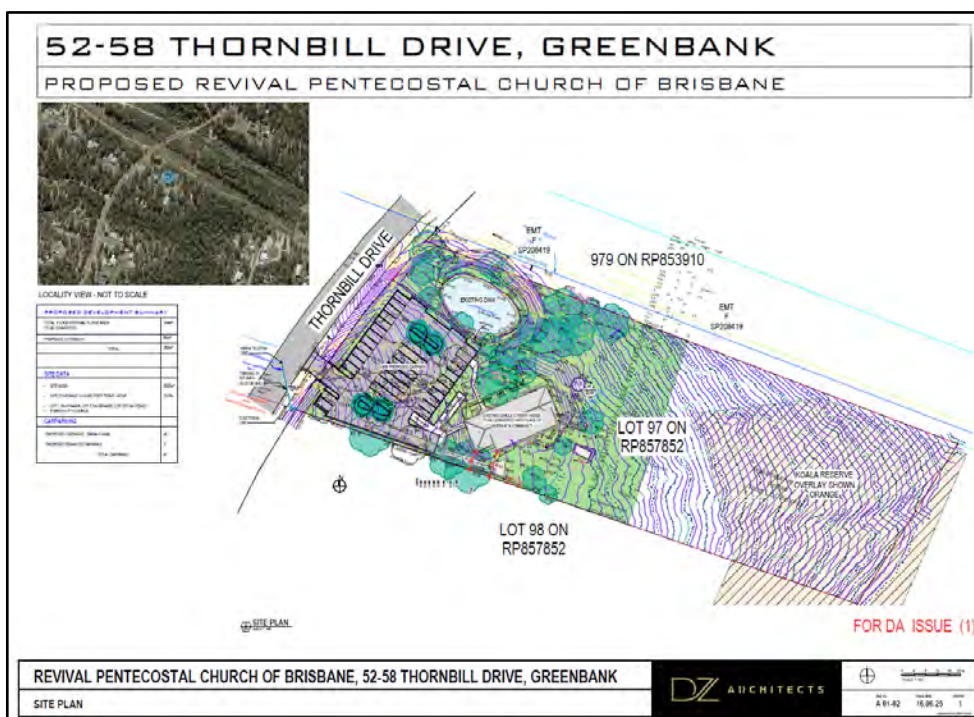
Site Plan (source: DZ Architects A 01-02, rev 1, dated: 16/06/24)
